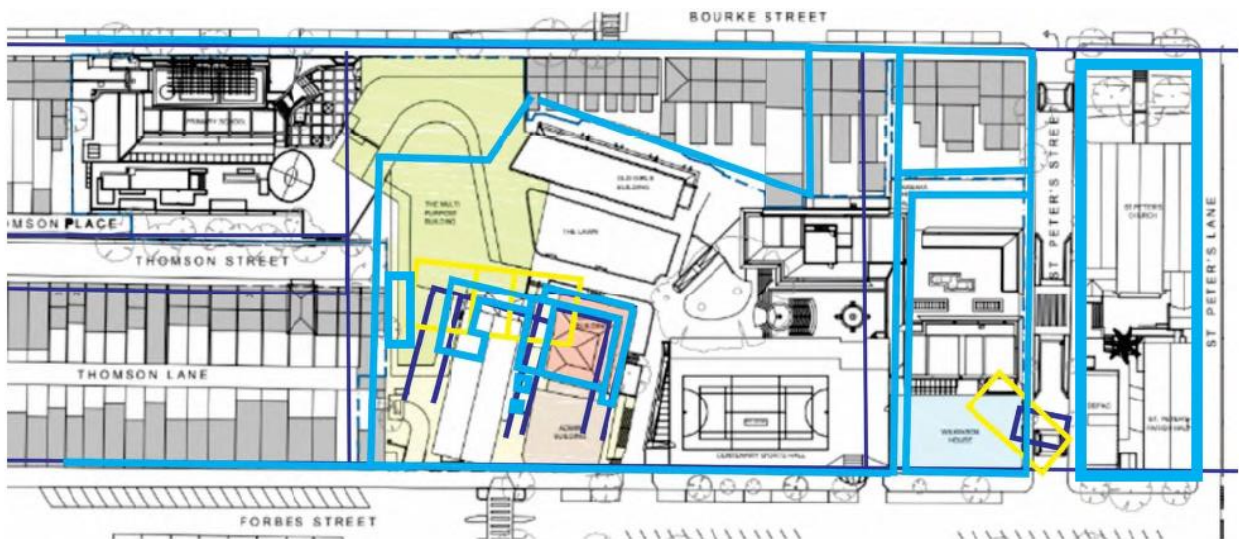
Overlay of Woolcott and Clarkes' 1854 plan (yellow) and Dove's 1888 plan (blue) on masterplan. A series of outbuildings are located to the east of Barham and one of the stone cottages is located within the footprint of Wilkinson House.
